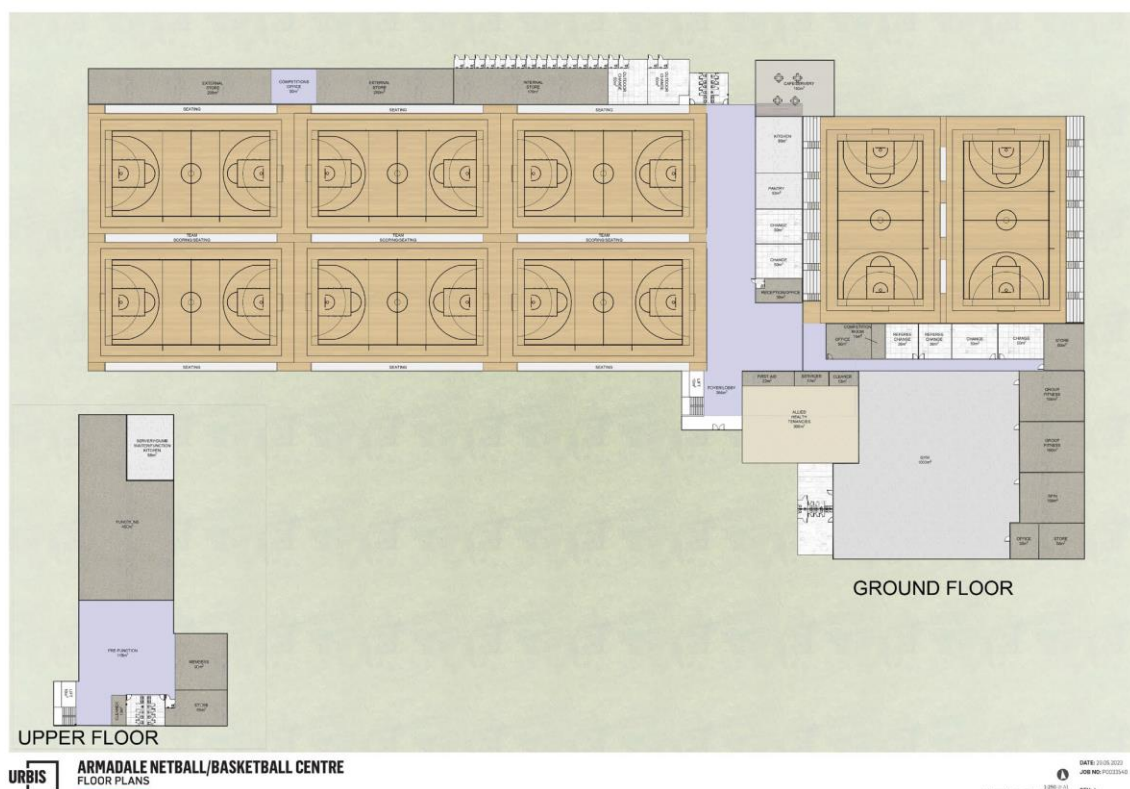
Armadale Netball/Basketball Facility Indoor Floor Plans
